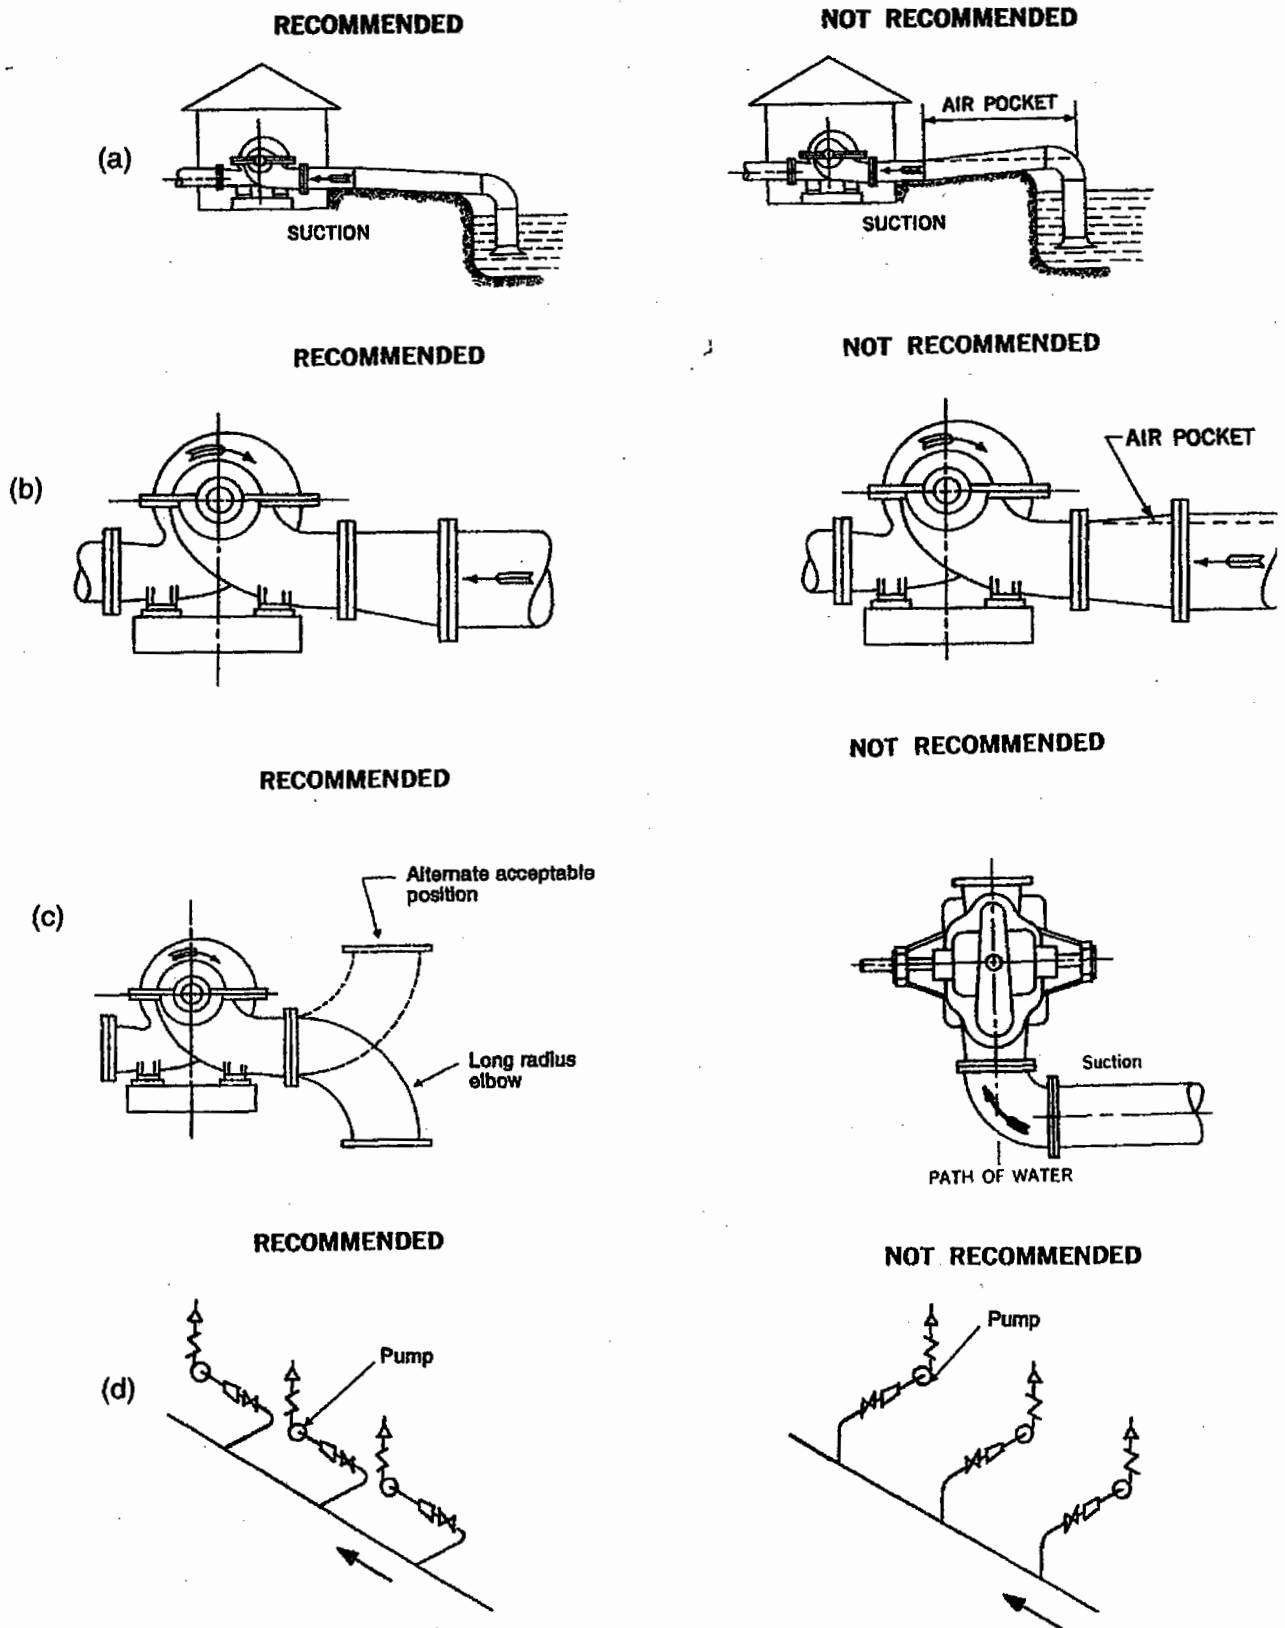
Recommended Suction Piping Layouts and Undesired Design Conditions (from Ref. 1; courtesy of the Hydraulic Institute): (a) suction piping should be level or have a slope upward towards the pump to prevent air traps; (b) suction piping should use eccentric reducers to prevent air traps; (c) avoid suction piping configurations that cause air imbalance in water distribution to the pump suction; and (d) piping arrangement for three pumps arranged for parallel operation.
